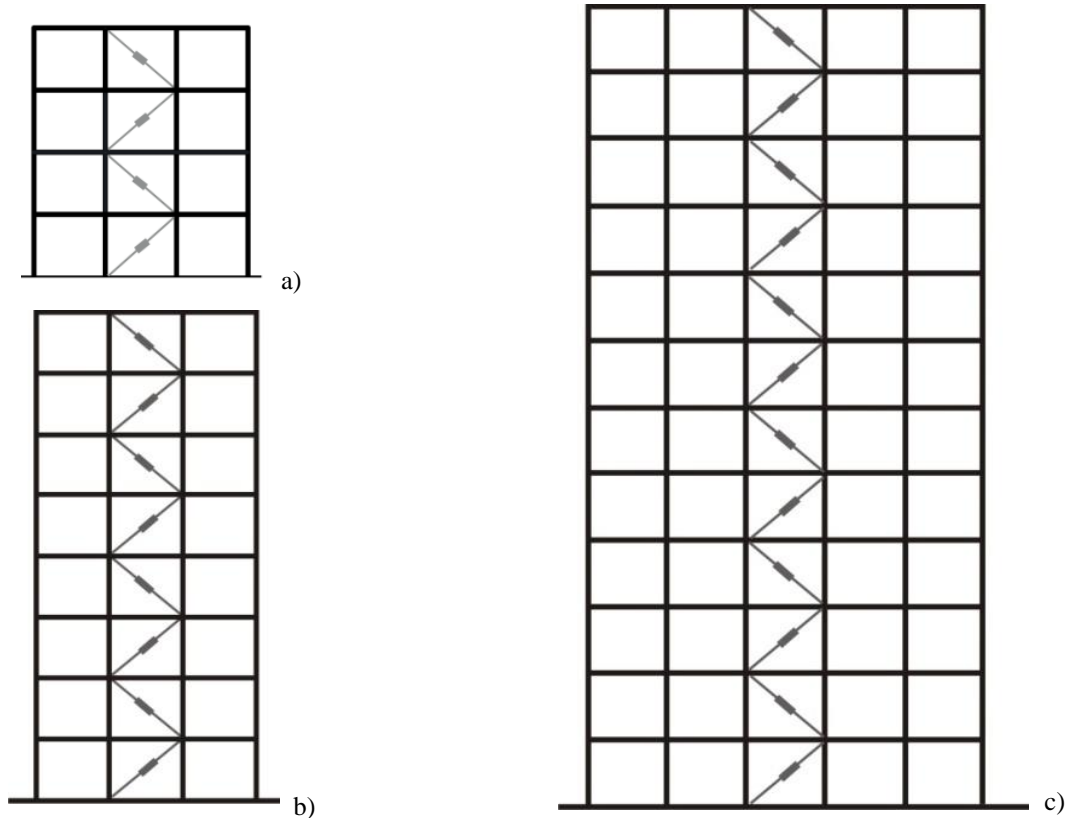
Dampers arrangement in the 3 bays-4 storeys a), 3 bays-8 storeys b), 5 bays-12 storeys c) frames.
